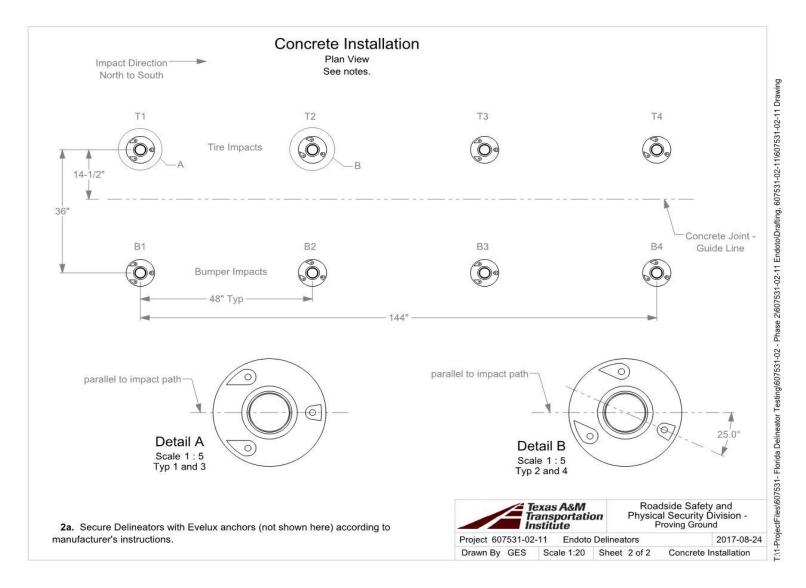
607531-02-11 Test Setup Details on Concrete Surface (Mechanical Anchors).
